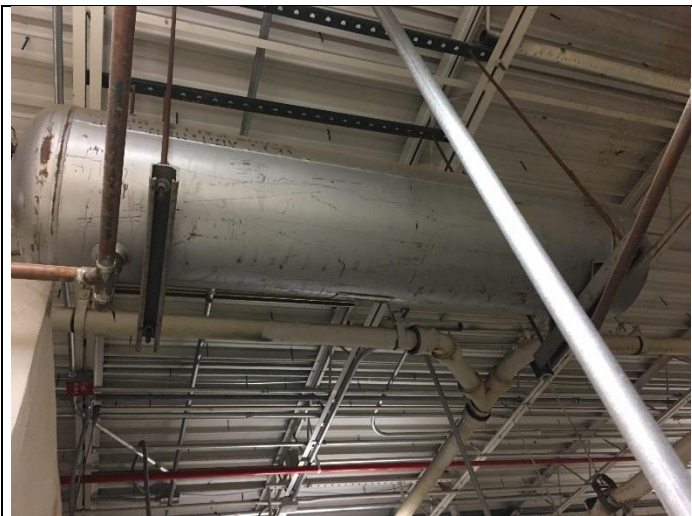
Silver Overhead Tank – Below Grade Mech. Room
